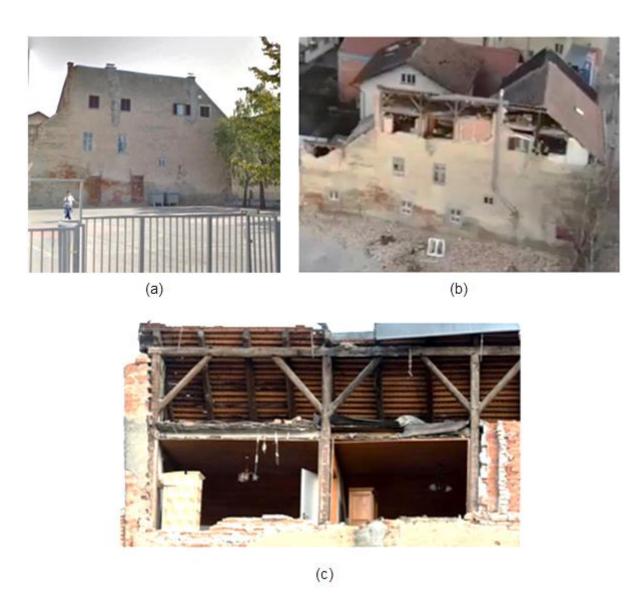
Collapse of exterior walls at the upper portion of a building in Petrinja: (a) before the earthquake (source: Google Earth), (b) damaged condition after the earthquake (source: Aeroklub Petrinja drone footage), and (c) detail of the exposed building interior and roof structure (source: Getty).
